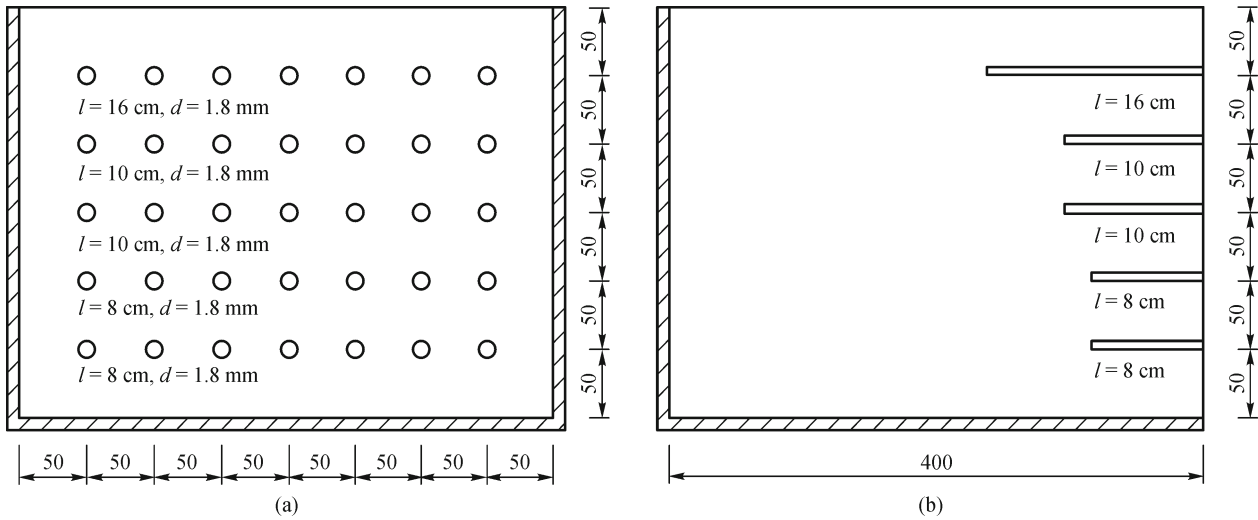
Arrangement of bolt. (a) Elevation view of bolt arrangement; (b) profile of bolt arrangement (case 5, unit: mm)
